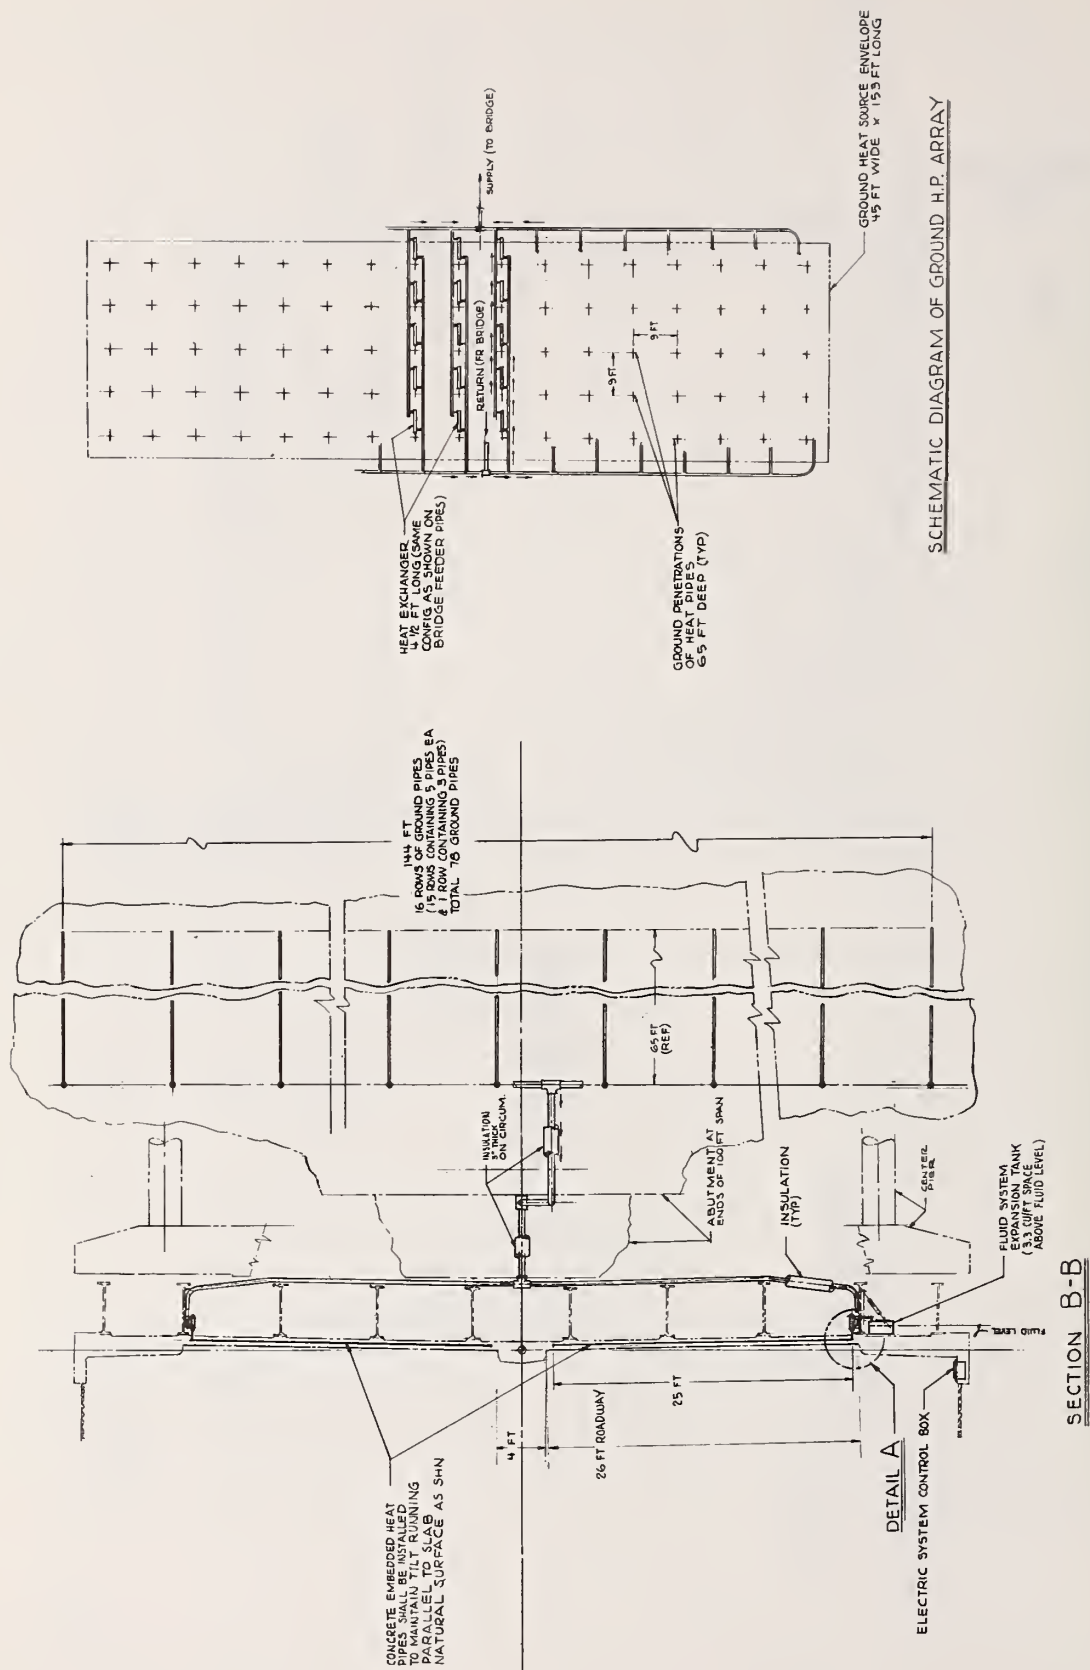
Bridge heat pipe installation (new bridge), sheet 3 of 3
